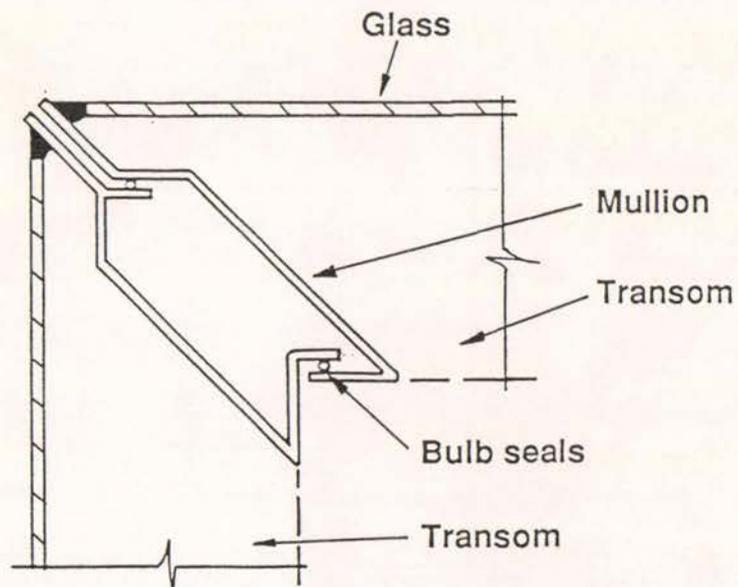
Plan - Preferred site corner detail using split mullion (Wall S4)
